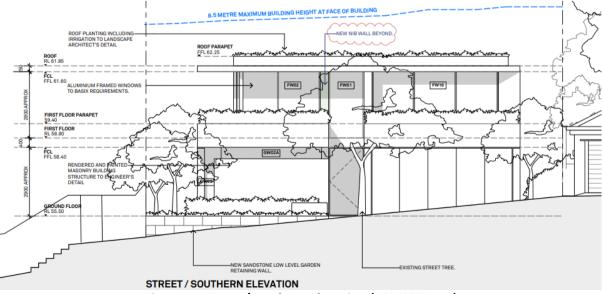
Street/Southern Elevation (455.06 Rev B)
